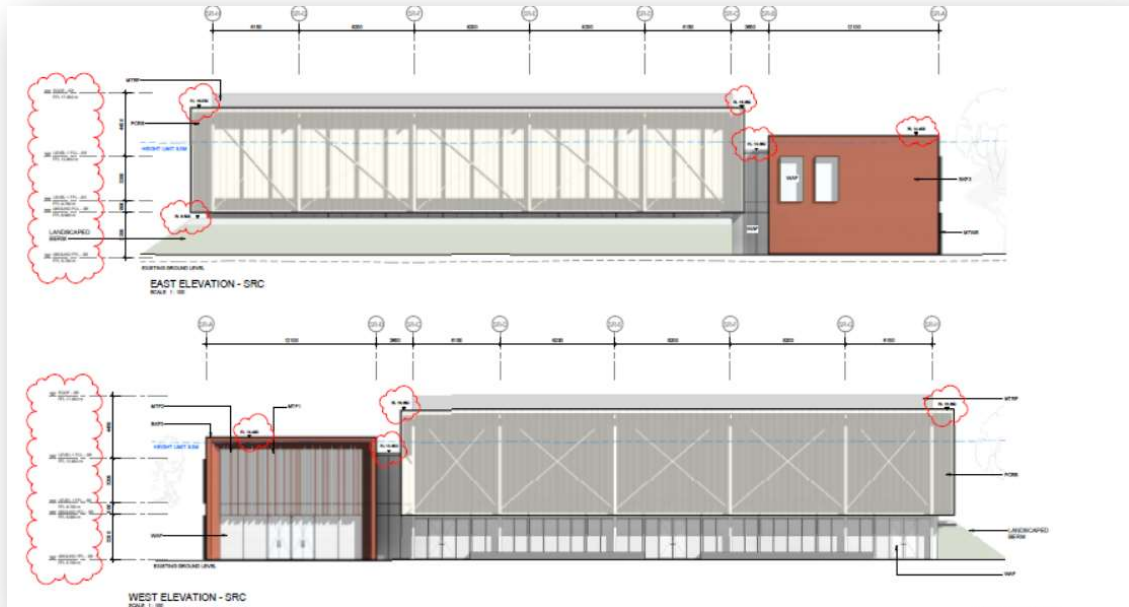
Extract from Elevations Plan (Drawing DA-SR-30-02) showing the east and west elevations of the Sports and Recreation Centre (Source: Cox Architecture 2023)
